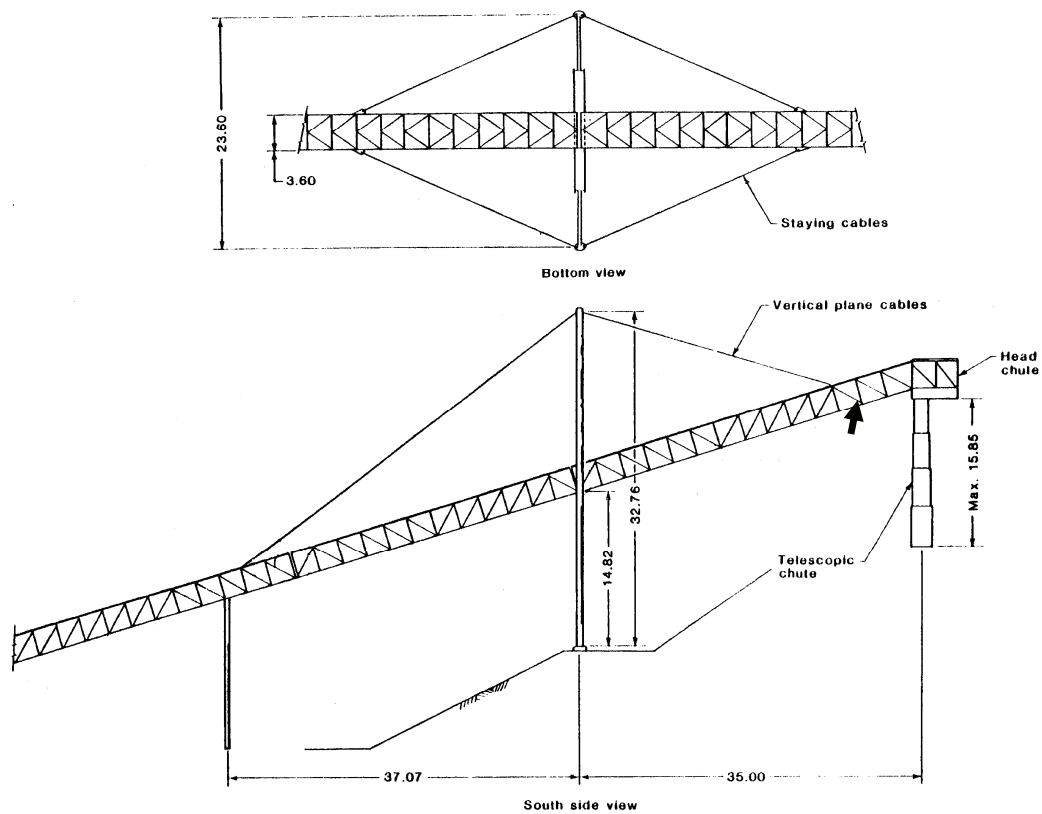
Schematic diagram of the structure of the loadout stage. The arrow indicates the joints where collapse started. The dimensions are shown in metres.
